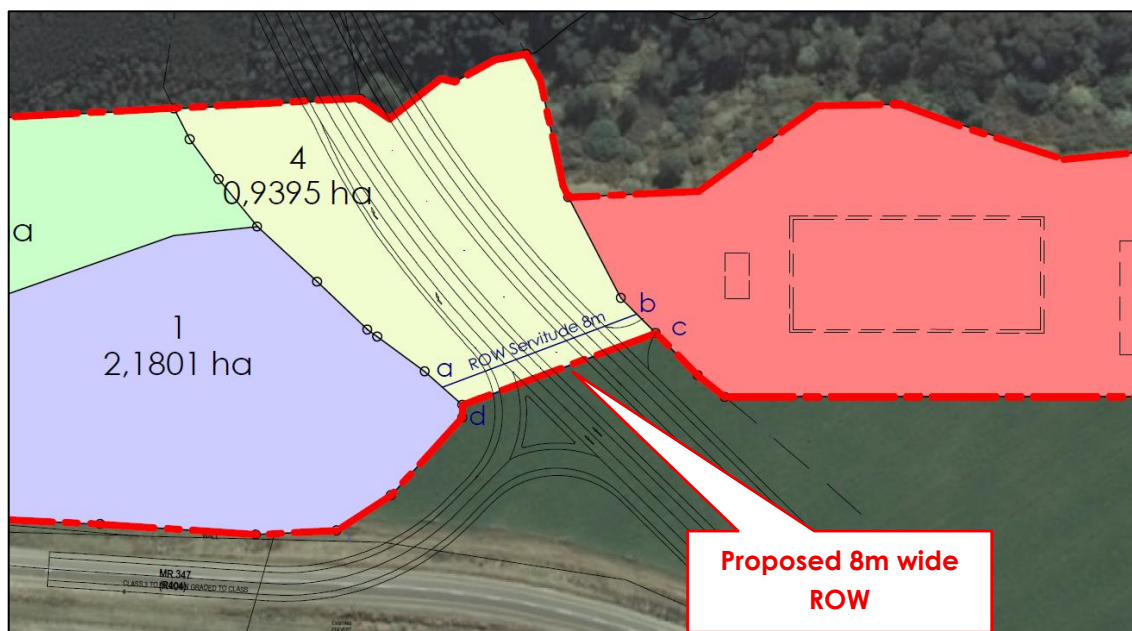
PROPOSED NEW 8M WIDE RIGHT OF WAY, PROVIDING ACCESS TO THE WWTW
